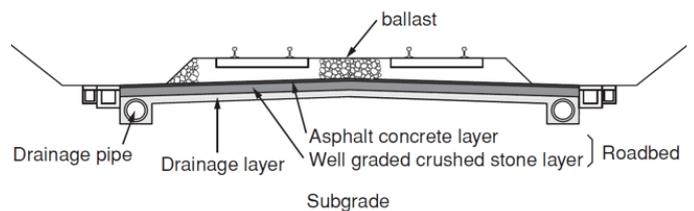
Cross section of ballasted track and asphalt roadbed [58]
